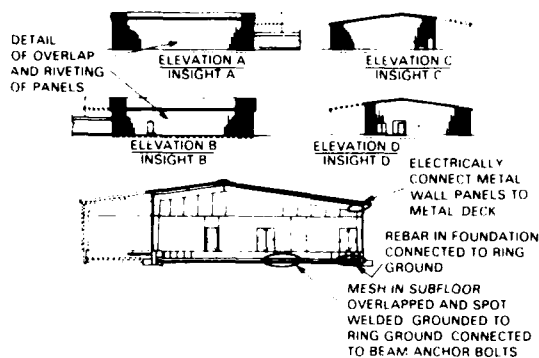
Operations building—elevations and sections showing HDL recommended modifications for electrical connectivity.
